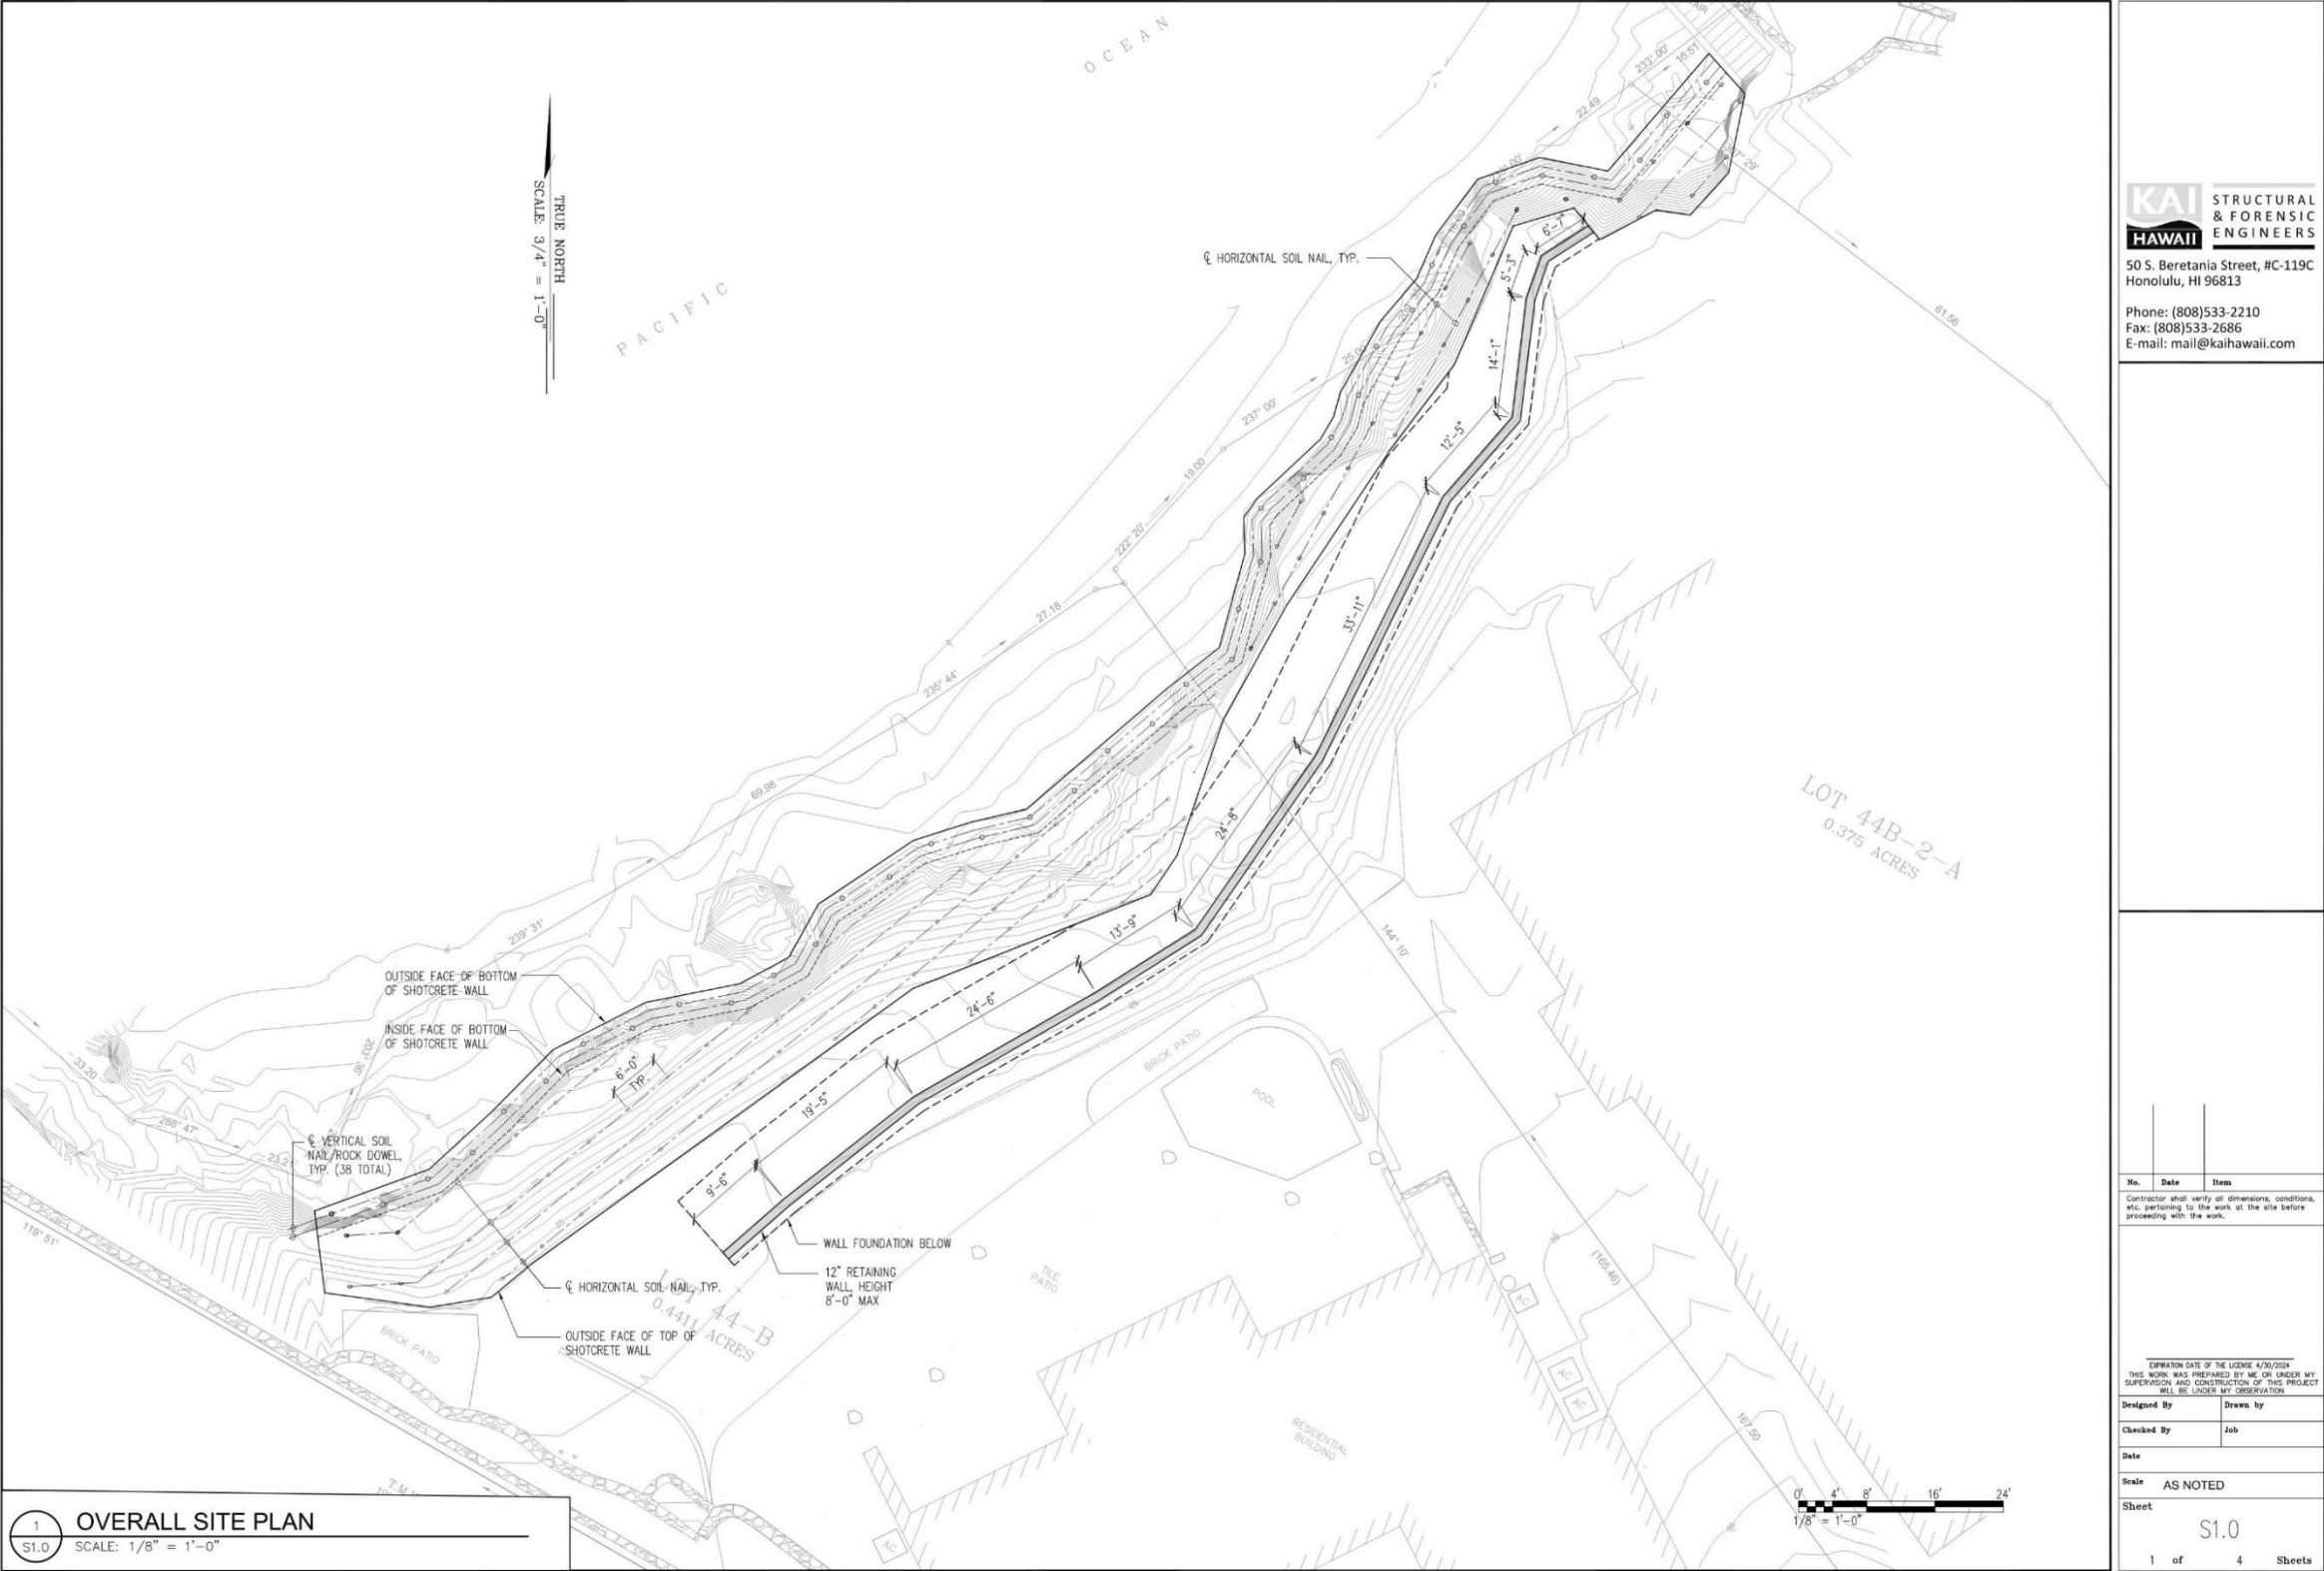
Reinforcement Concept Site Plan (Source: Kai Hawaii, 2024)
